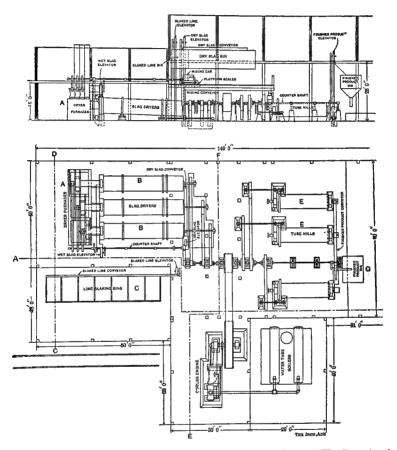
Elevation and plan of Stewart slag-cement plant. (The Iron Age.)
